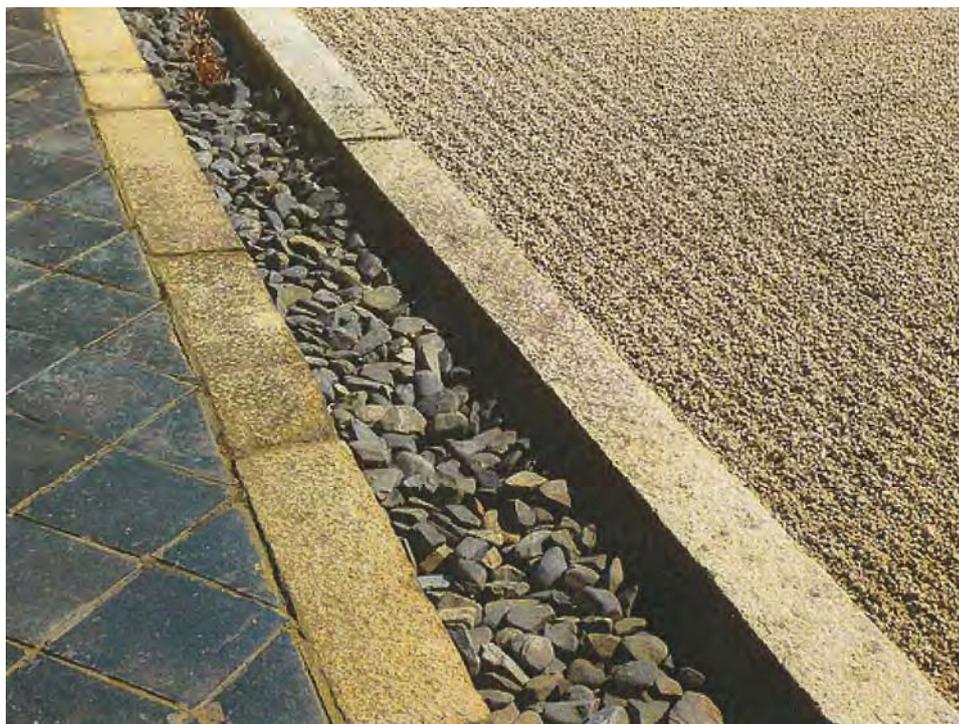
Detail of natural stone pavement – garden of stone Ryoan-Ji, Kyoto, Japan
